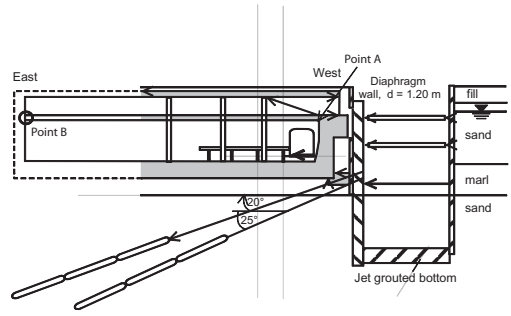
Cross section of city railway station and excavation wall at Potsdamer Platz in Berlin.
